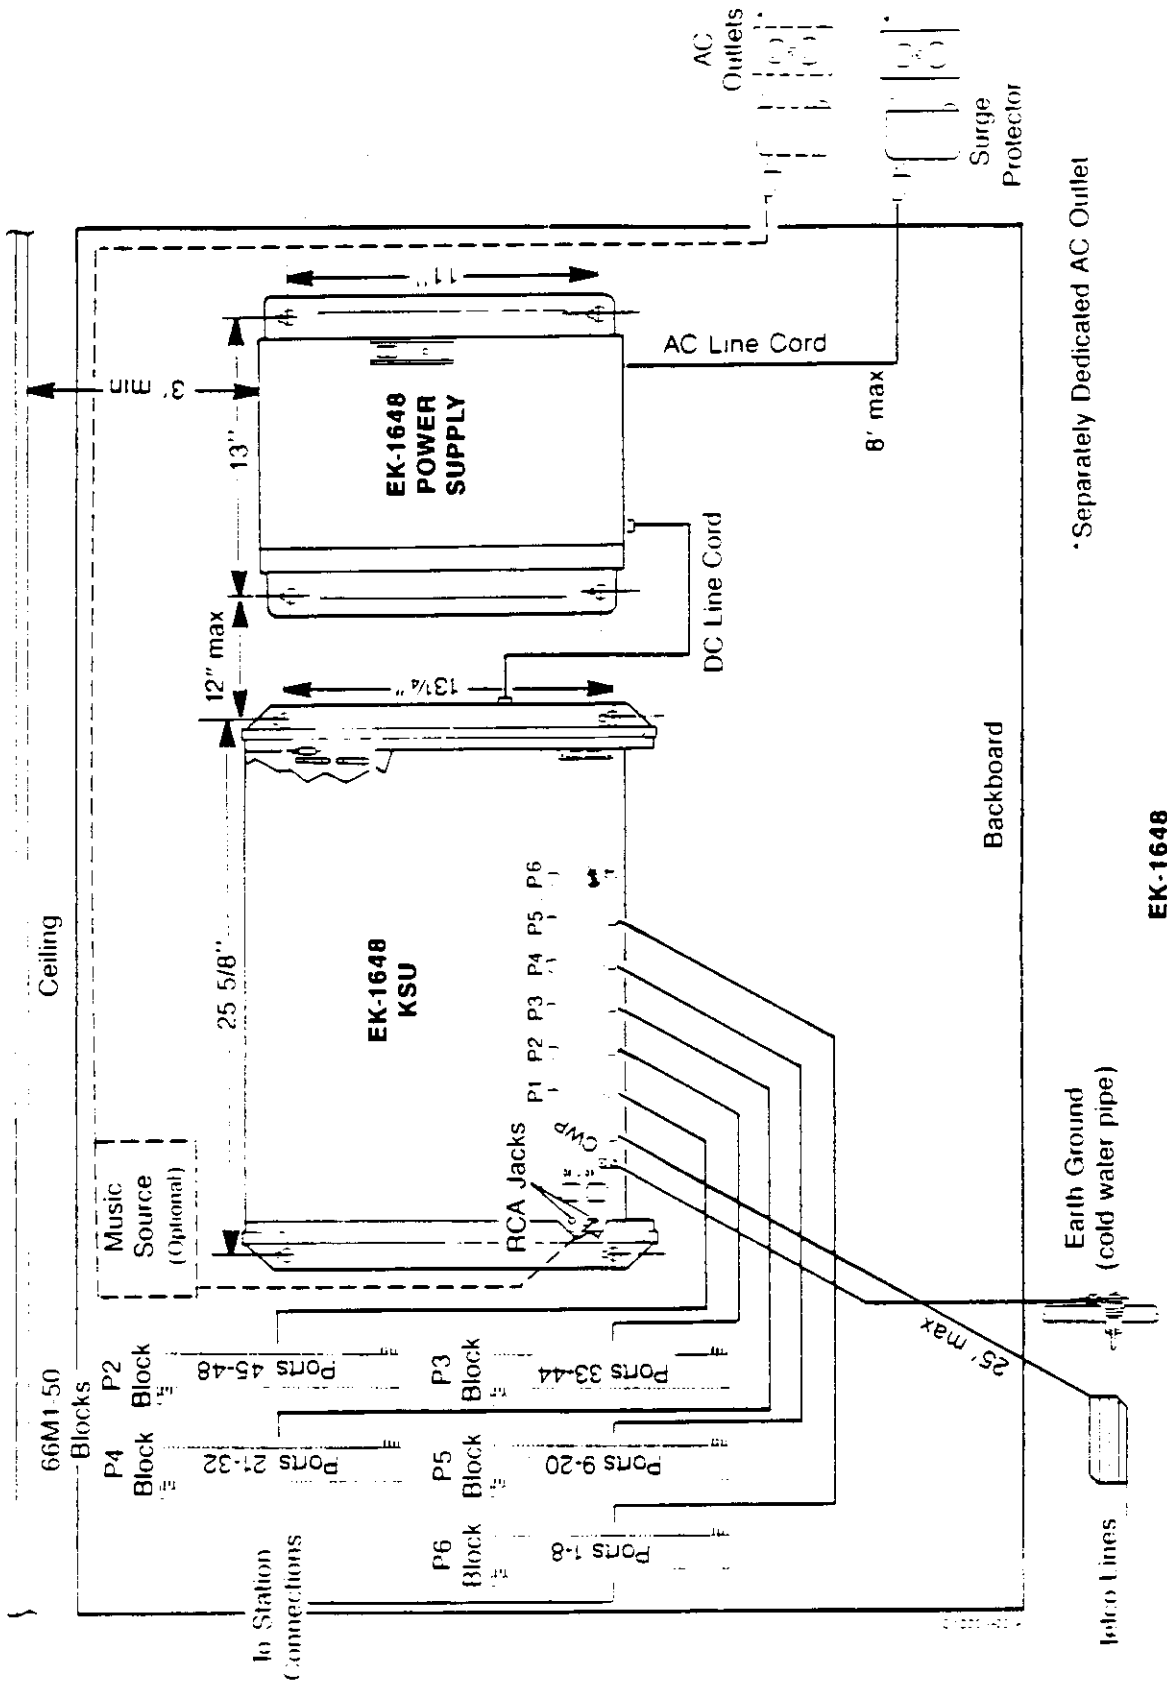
TYPICAL SITE LAYOUT, EK-824/1232/1648 (Page 2 of 2)
